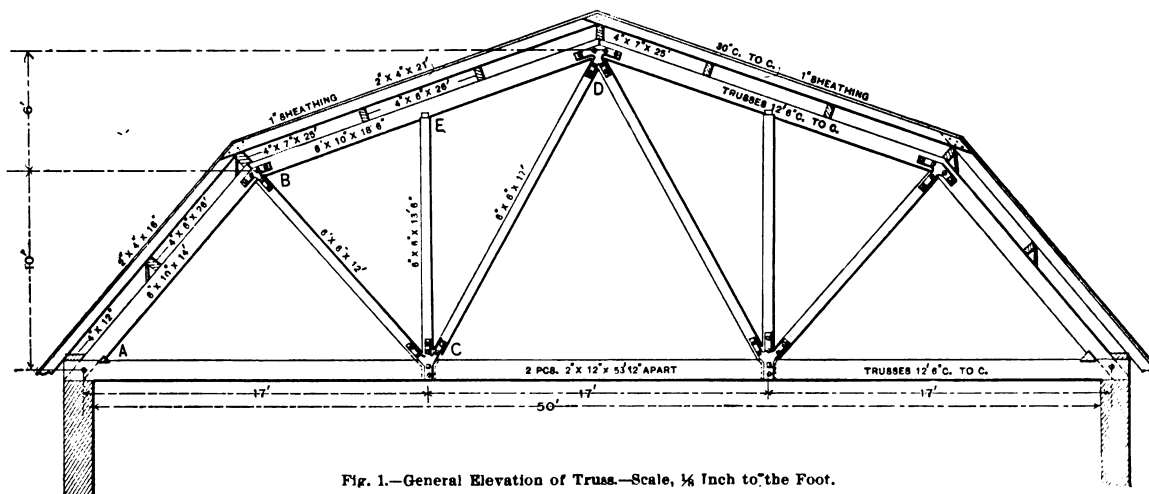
General Elevation of Truss.—Scale, 1/4 Inch to the Foot.
